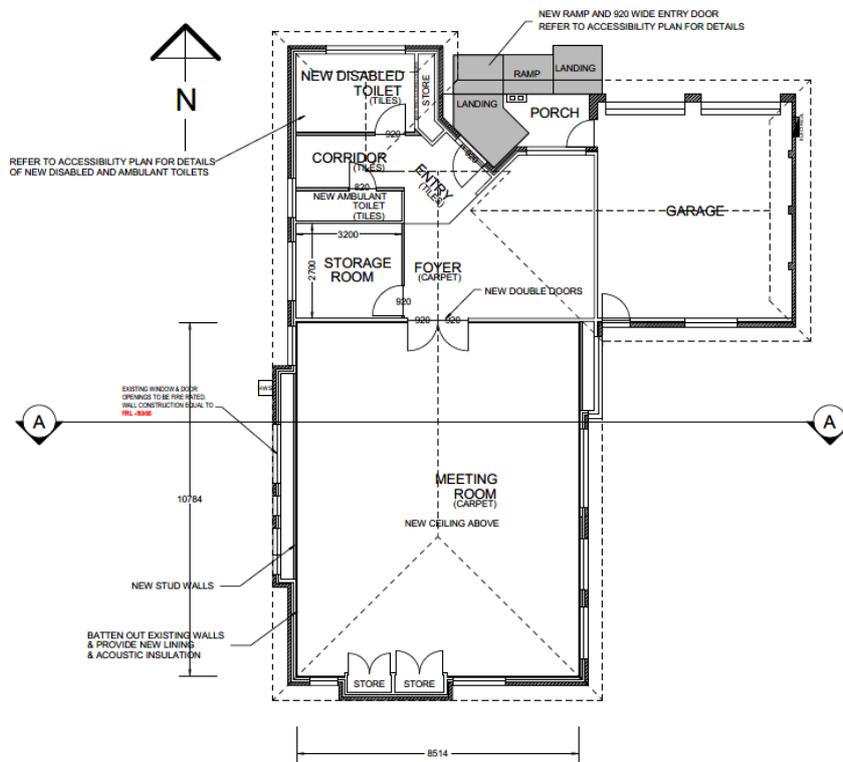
Original Floor Plan Proposal Under DA.2020.1109 (prepared by Tru-Line Design)
